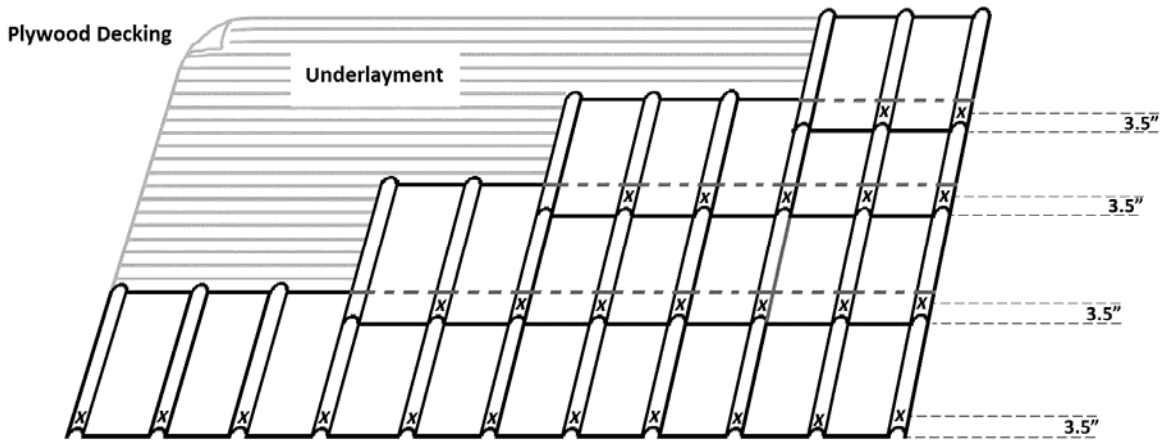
TYPICAL FASTENING PATTERN FOR ONDUVILLA® / ONDUVILLA® FR TILES (SEE SYSTEM NO.5, TABLE 2)
